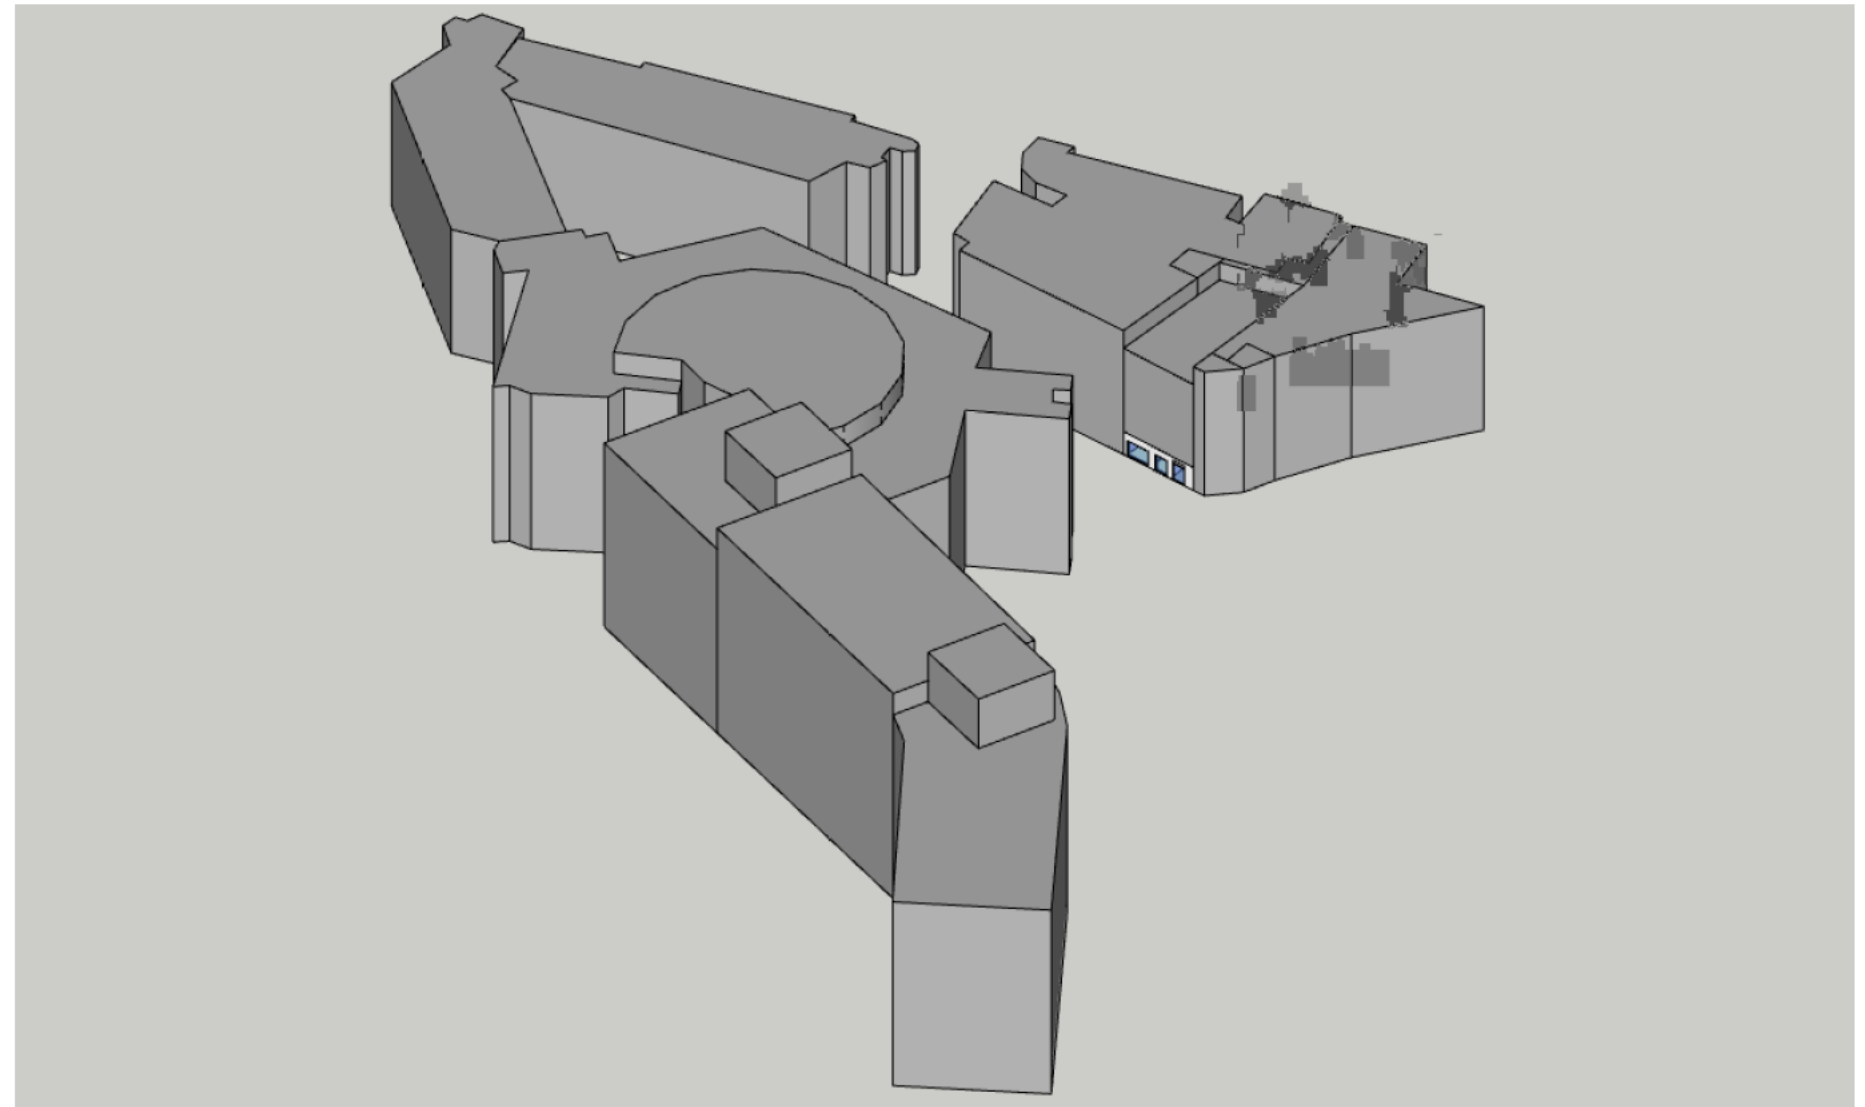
Daylight Model with Surrounding Buildings (Assessed Dwelling in White)
